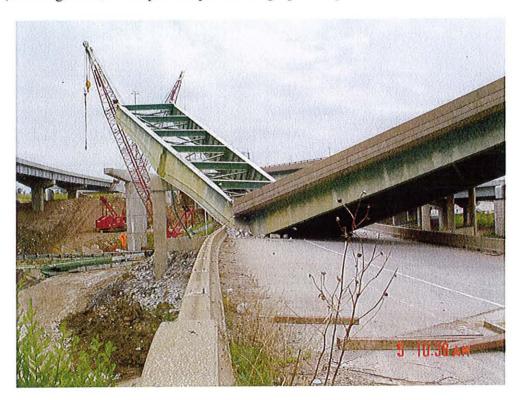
(Looking north, collapsed bridge girder span 2-3 fell on lower bridge)
